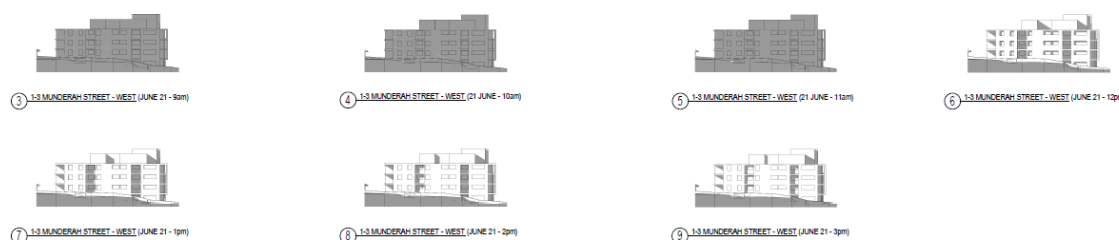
Existing solar impacts 21 June on 1-3 Munderah Street (West)
